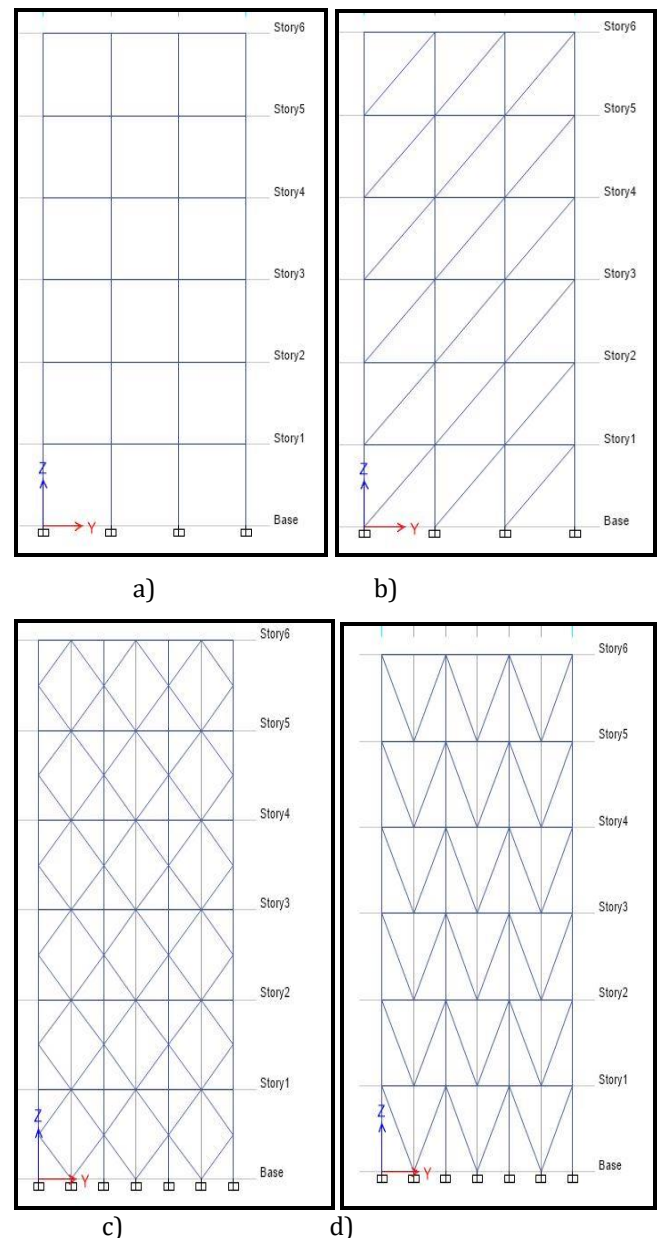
Elevation of bare frame, 2b: Elevation of diagonal frame, 2c: Elevation of diamond frame, 2d: Elevation of V frame
